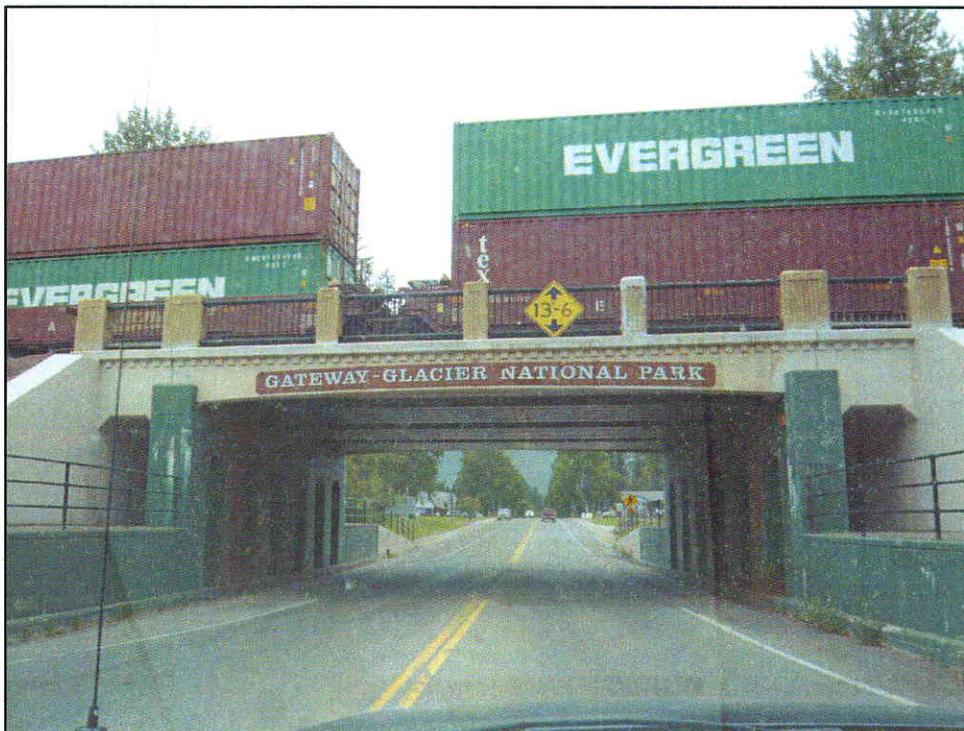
Typical Section looking north at Half Moon Flats Road
